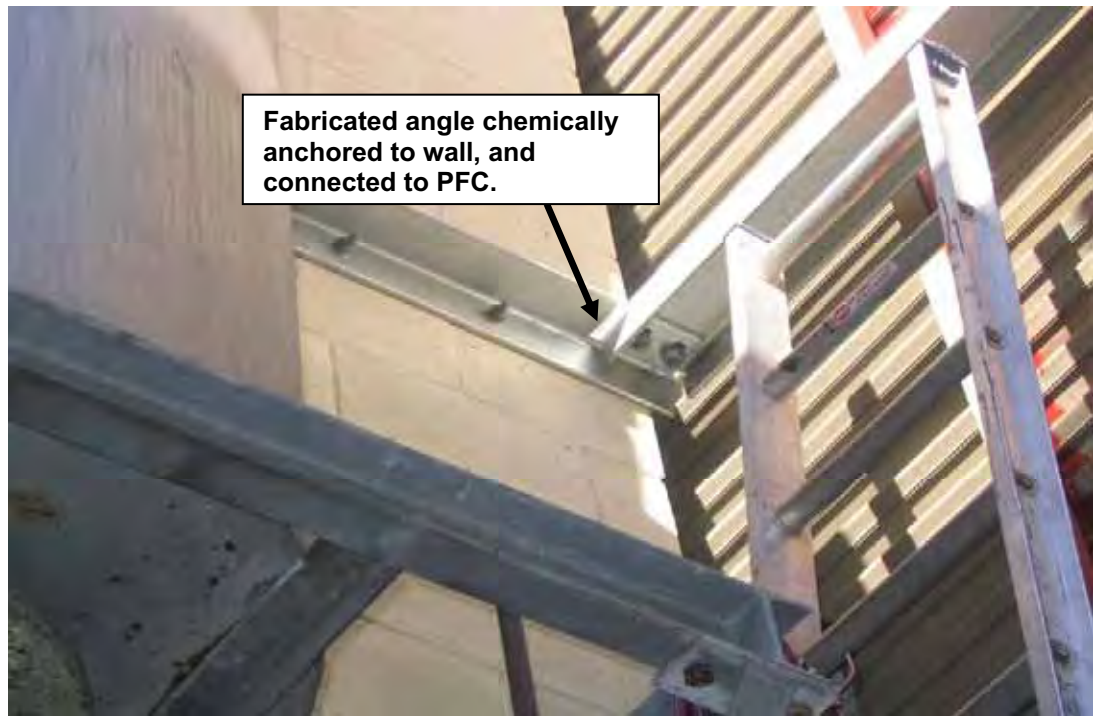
PFCs facing south and in southwest corner connected to wall using M18 chemical anchor bolts and structural equal angle; PFCs fabricated as additional support for waist section of new fabricated louvre system in southwest section.
